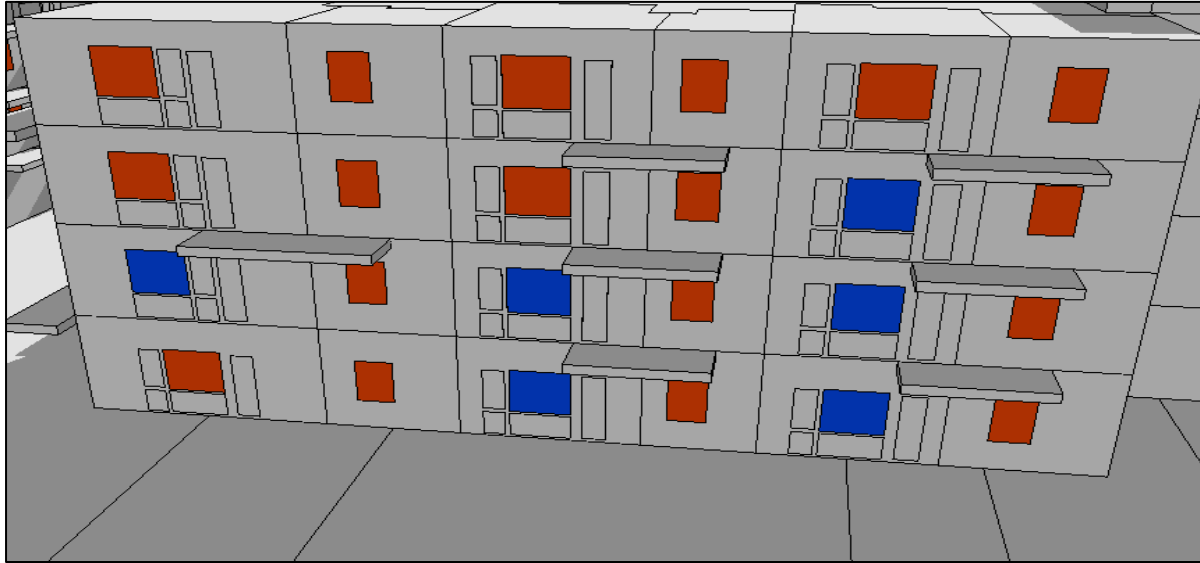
Windows achieving 1.5 hours of sunlight - Northwest elevation of Building 09 (modelling software)
